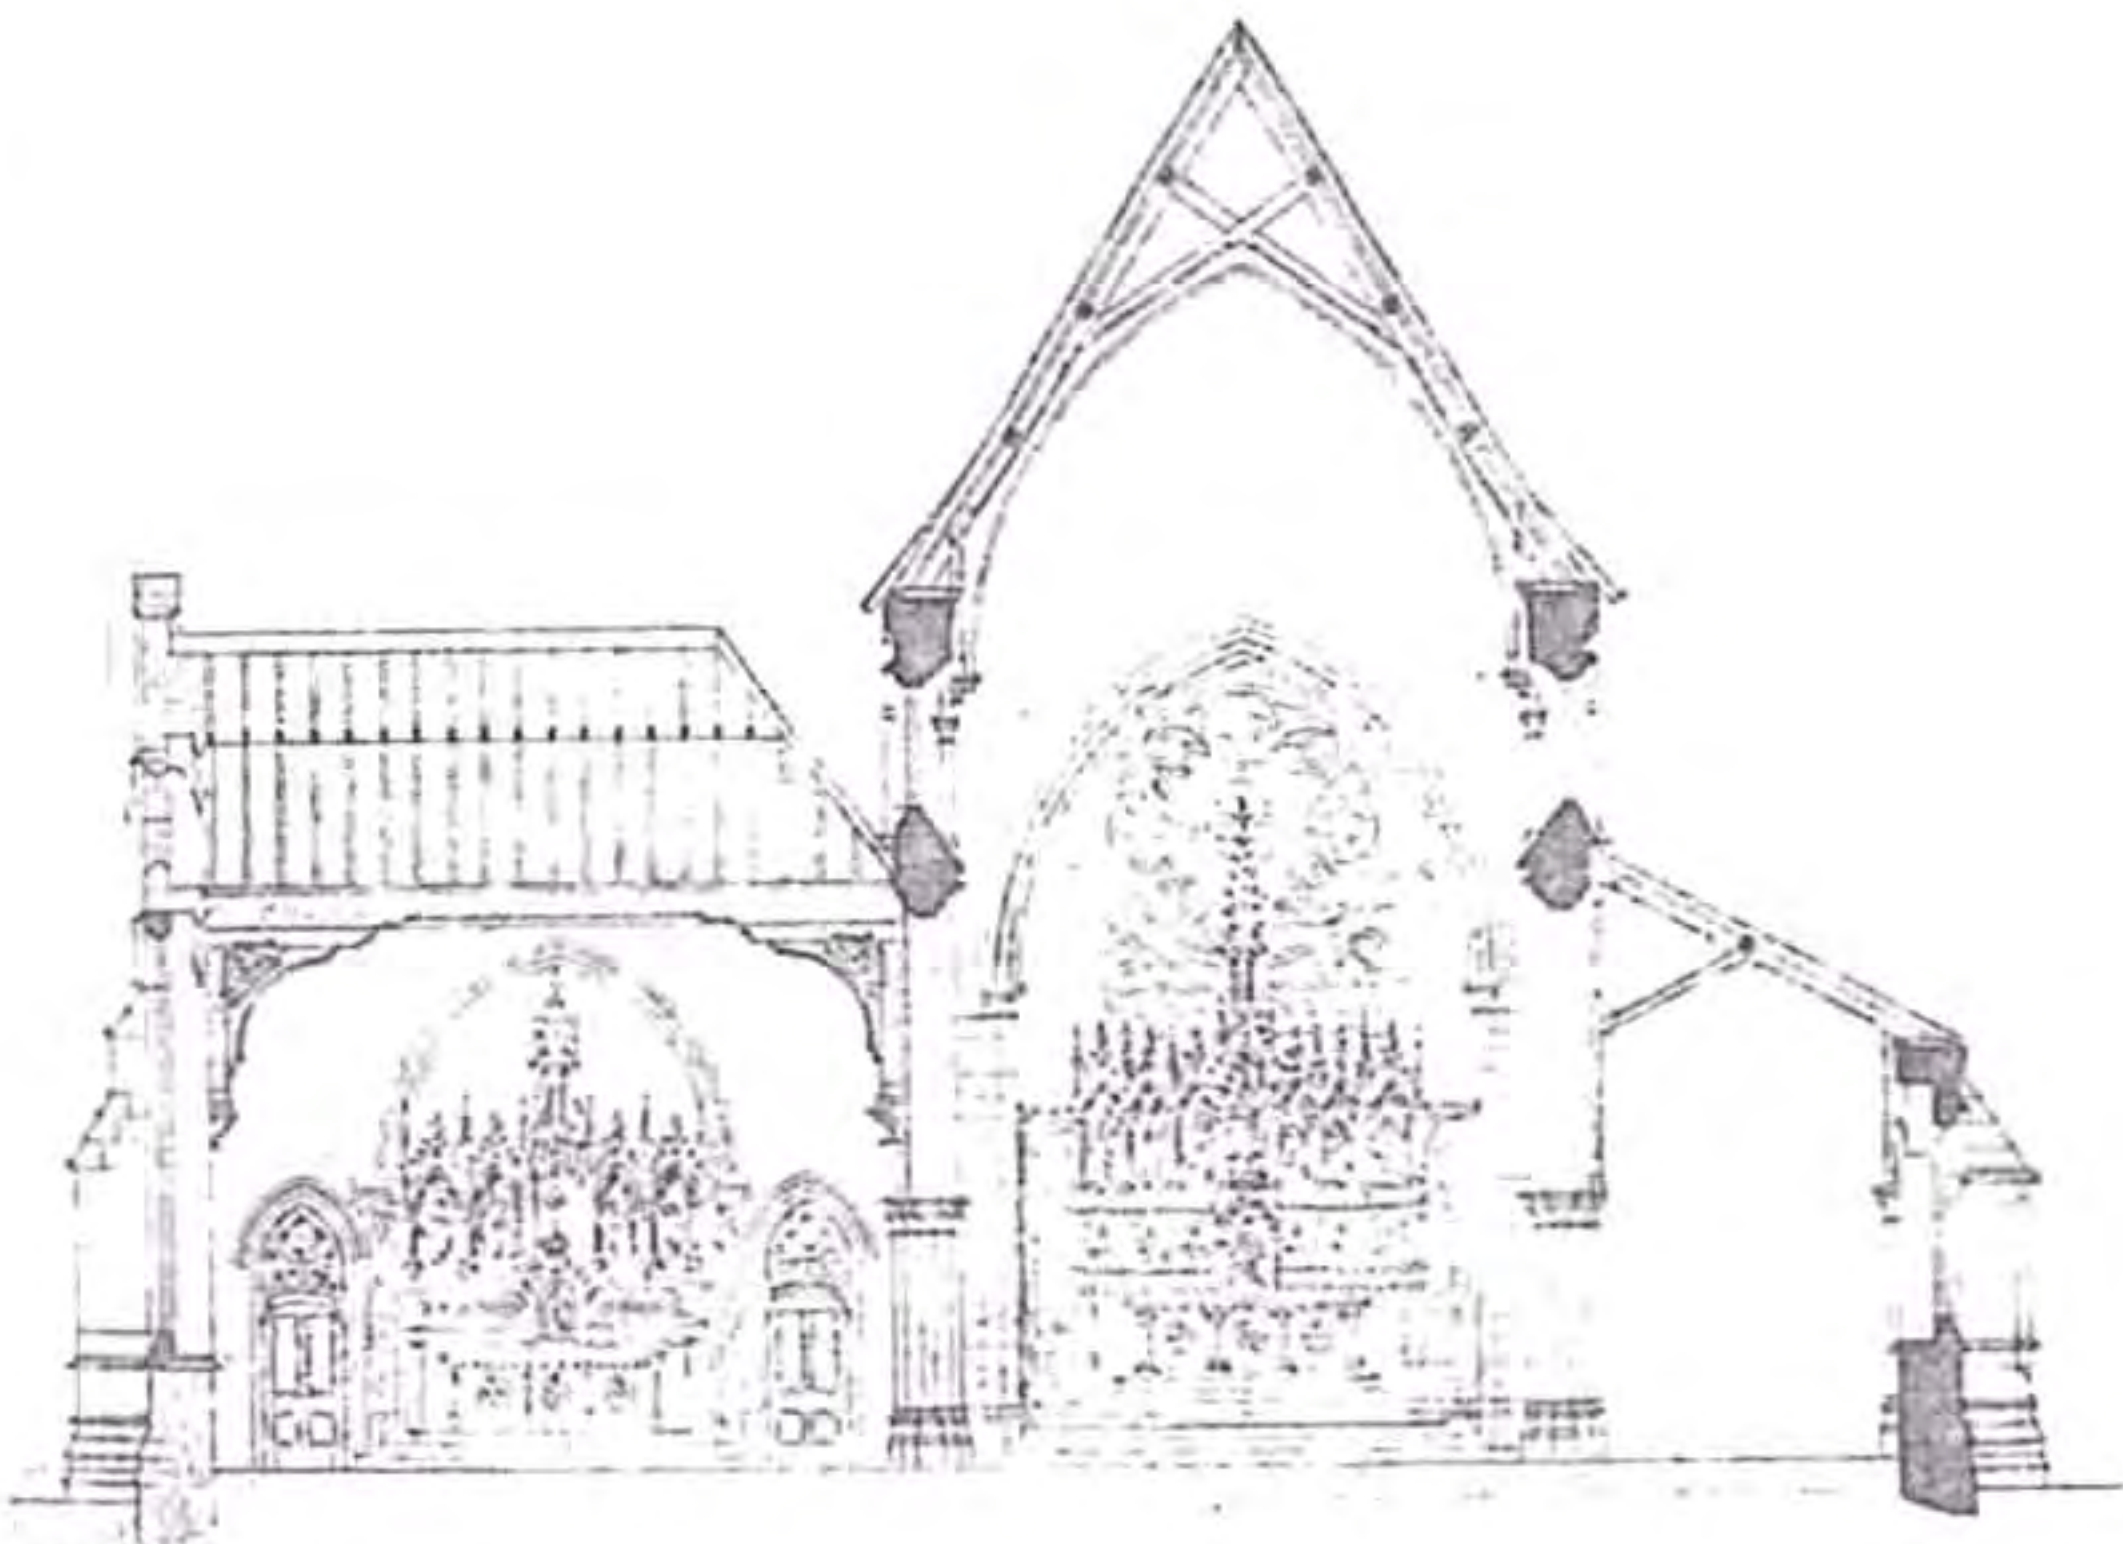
1881 sectional elevation looking east showing Pugin’s altar designs, wide north aisle and chancel east window Woods Bagot Pty Ltd.
